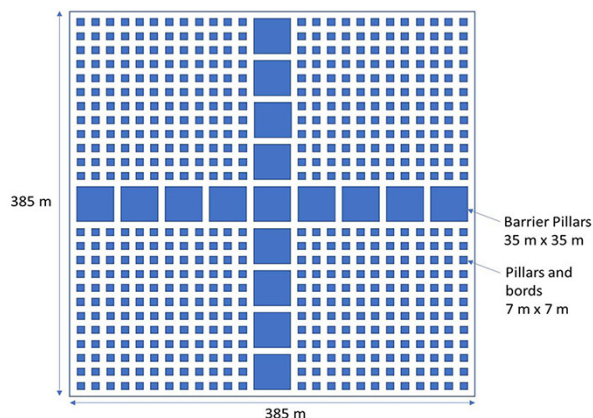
Barrier pillar layout (after Couto and Malan, 2023b)
